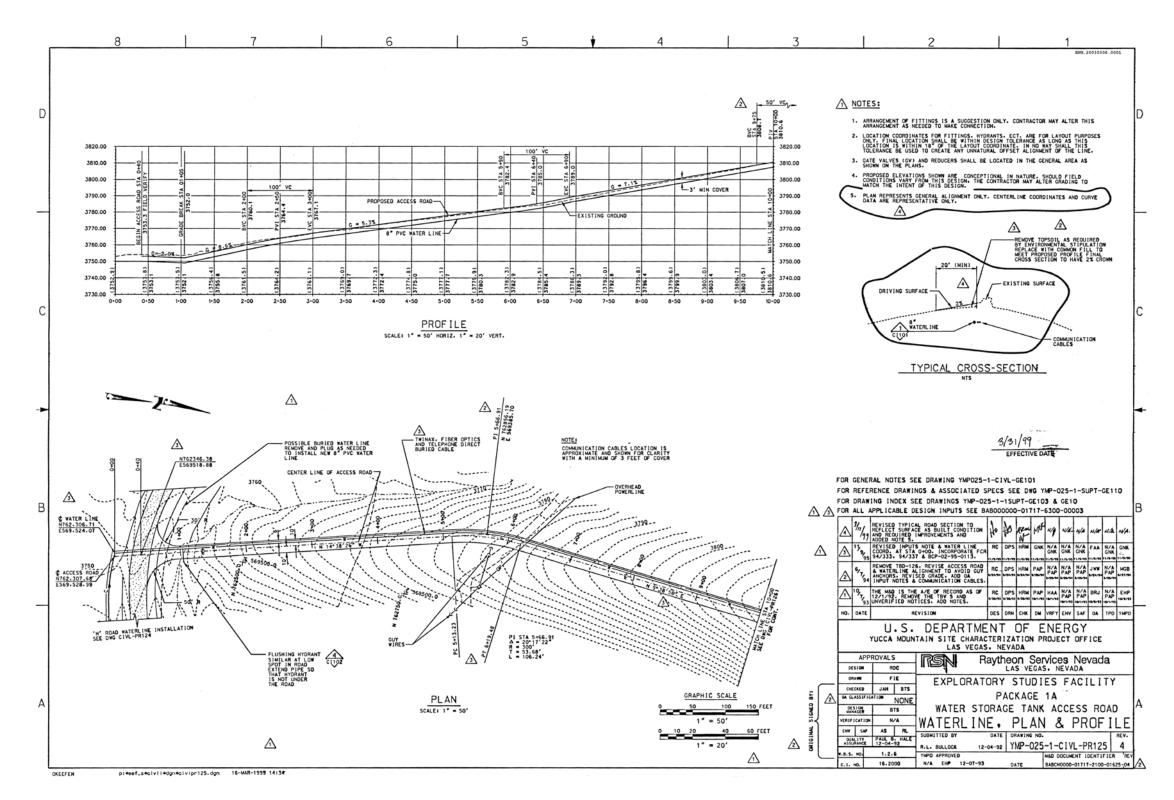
Exploratory Studies Facility Package 1A Water Storage Tank Access Road Waterline Plan & Profile (Sheet 1 of 2)
